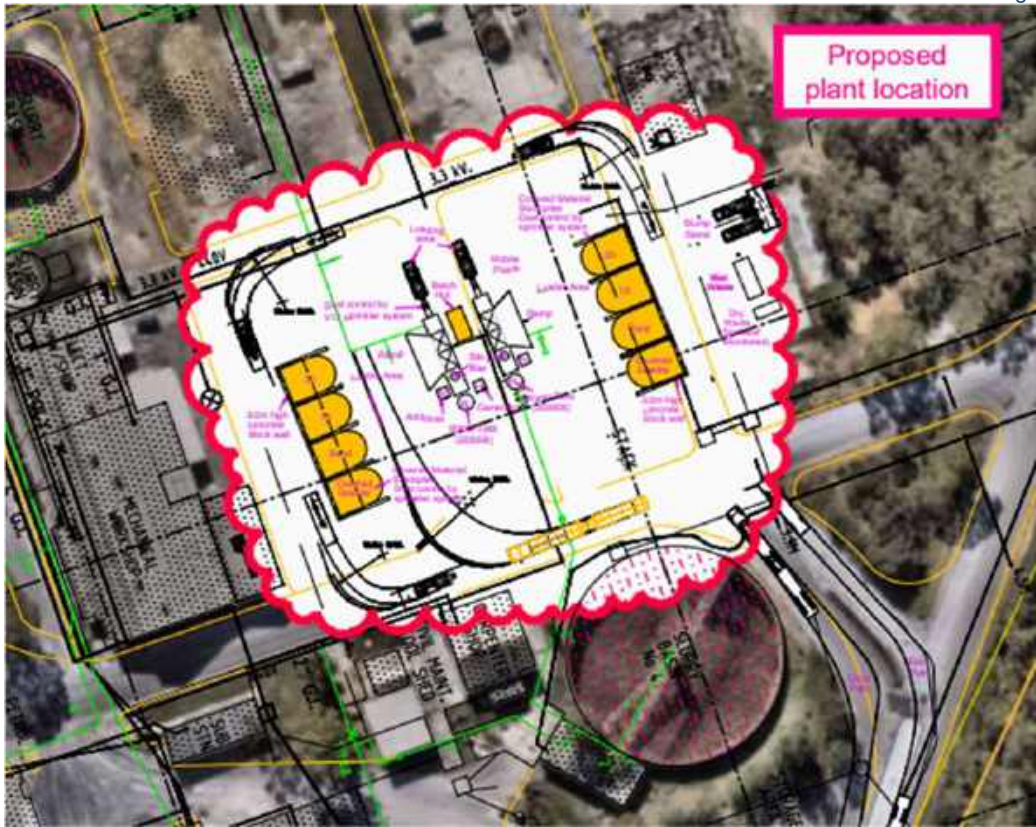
Proposed Location of Mobile Concrete Batch Plant, at Lot 242 Russell Rd Munster
